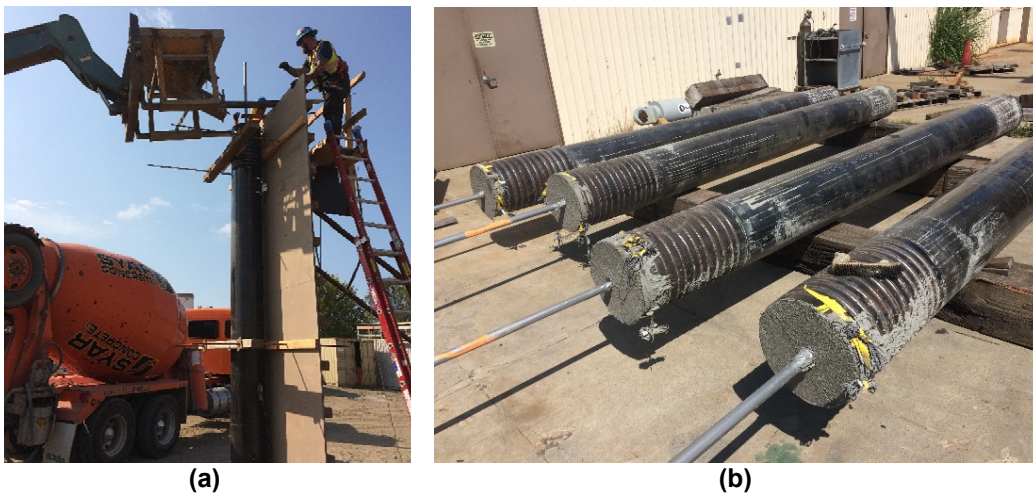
(a) Cast the concrete; (b) final completed columns.
